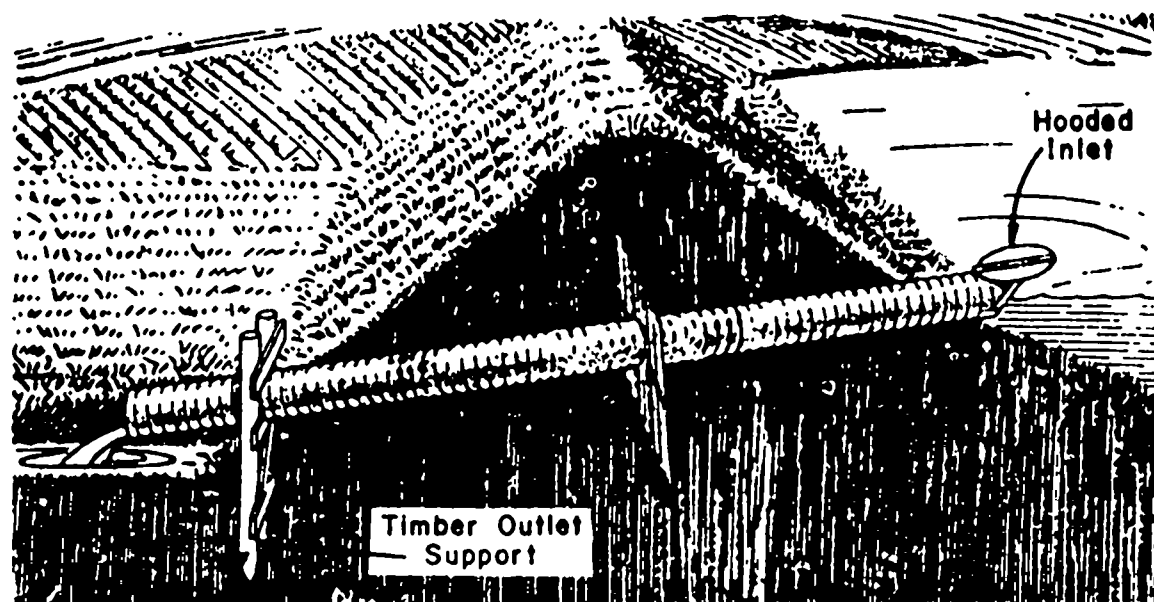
Hood CMP Outlet (U.S. Soil Conservation Service, 1969)
